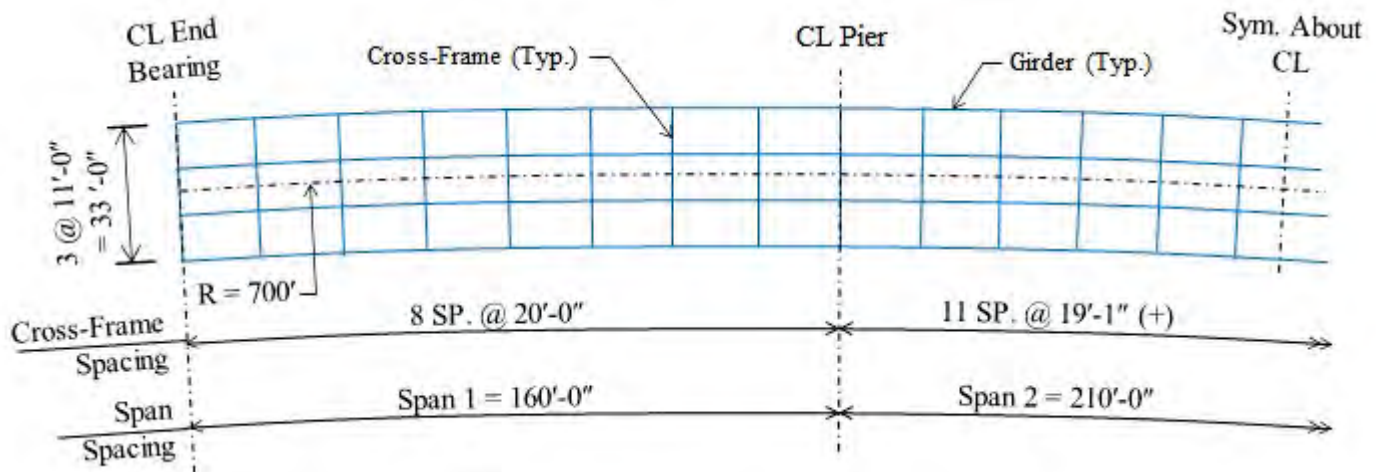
Sketch of superstructure framing plan of bridge; adapted from Rivera and Chavel (2015)
